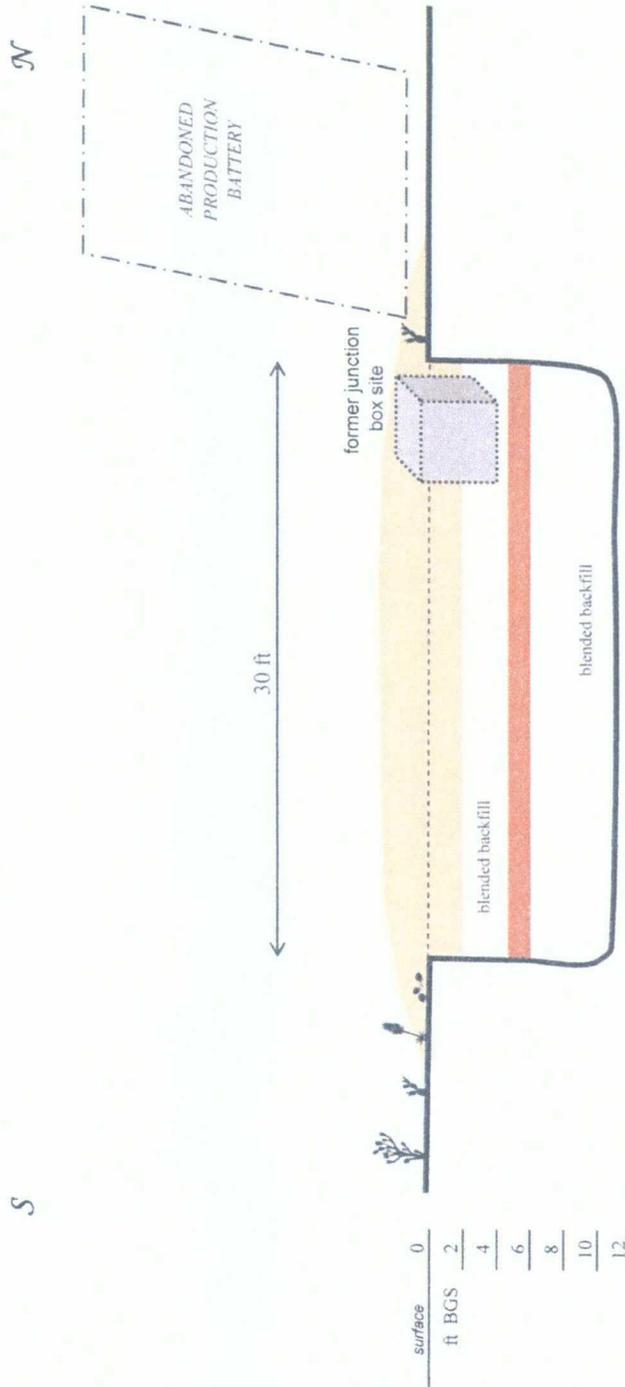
Schematic cross sectional diagram of former junction box and excavation.
